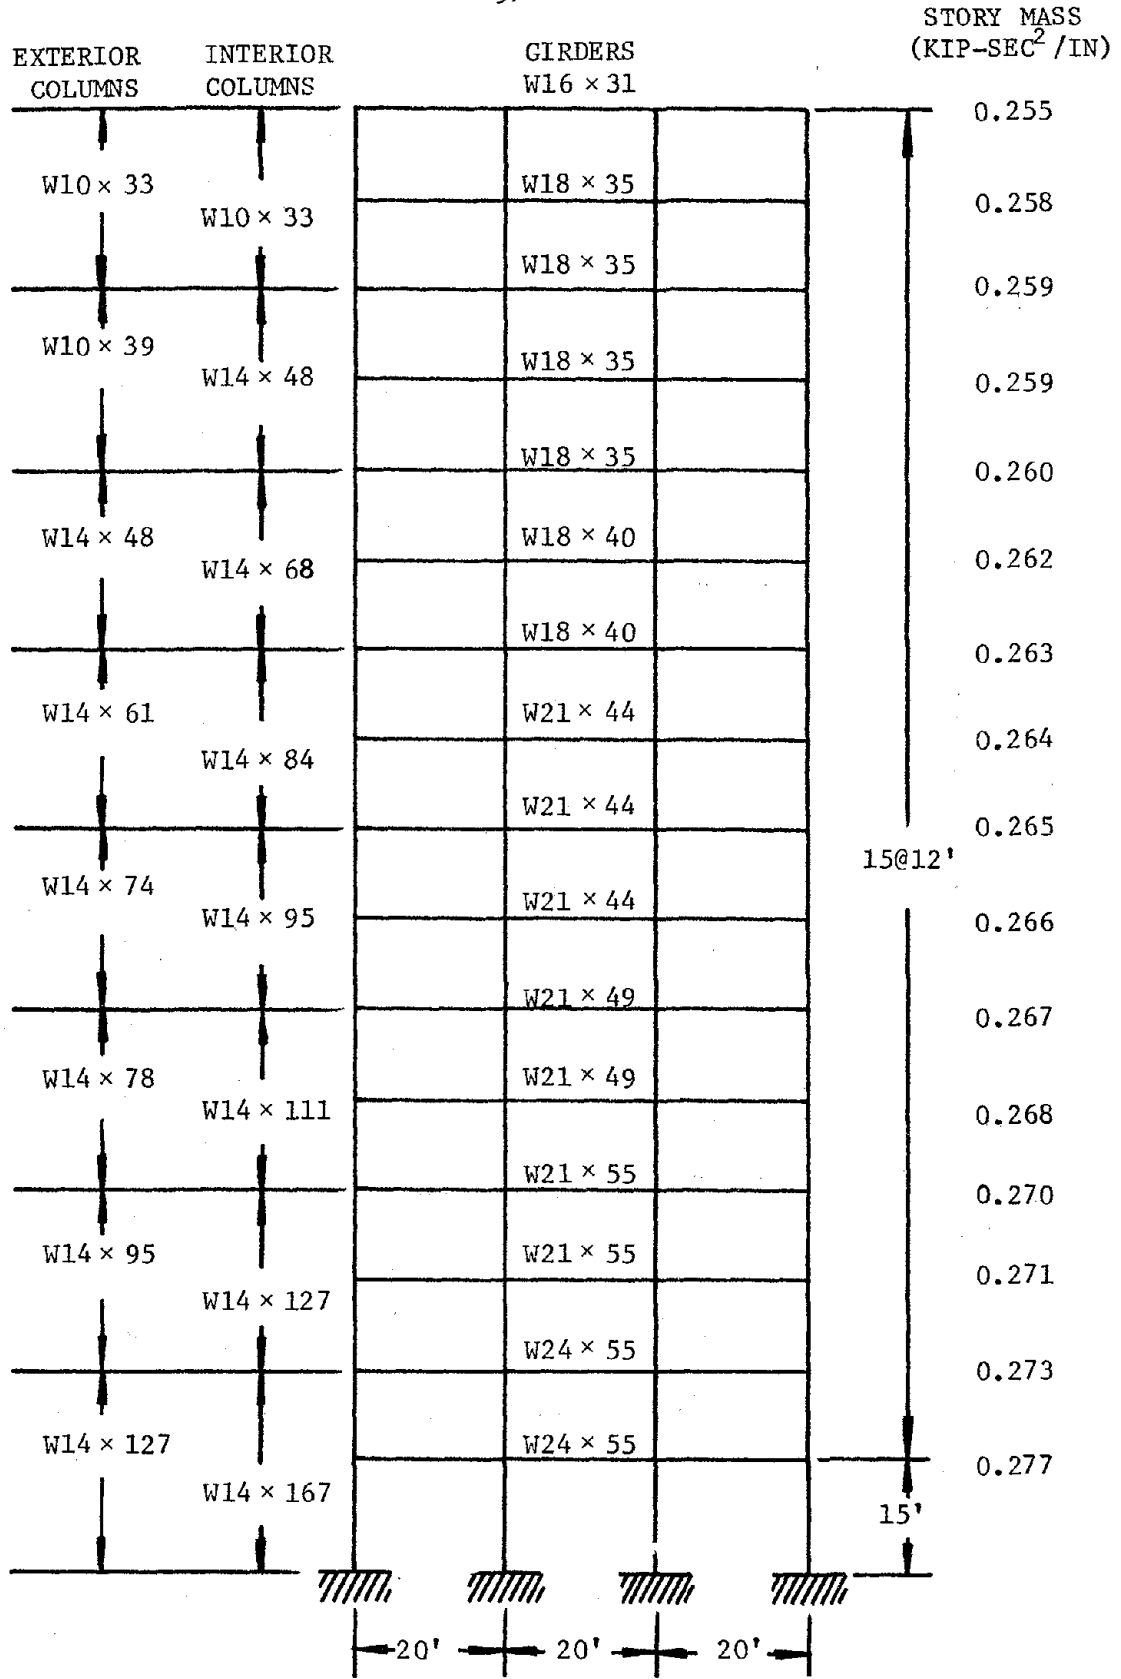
16-STORY STEEL FRAME ELEVATION [PIQUE, 49]
